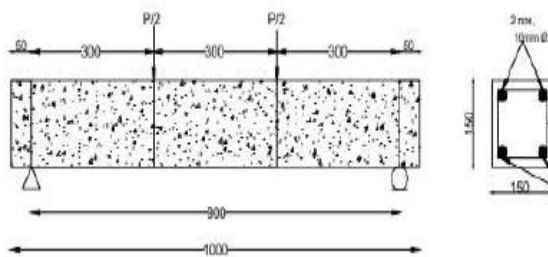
Loading Diagram and Reinforcement detailing of the beam
